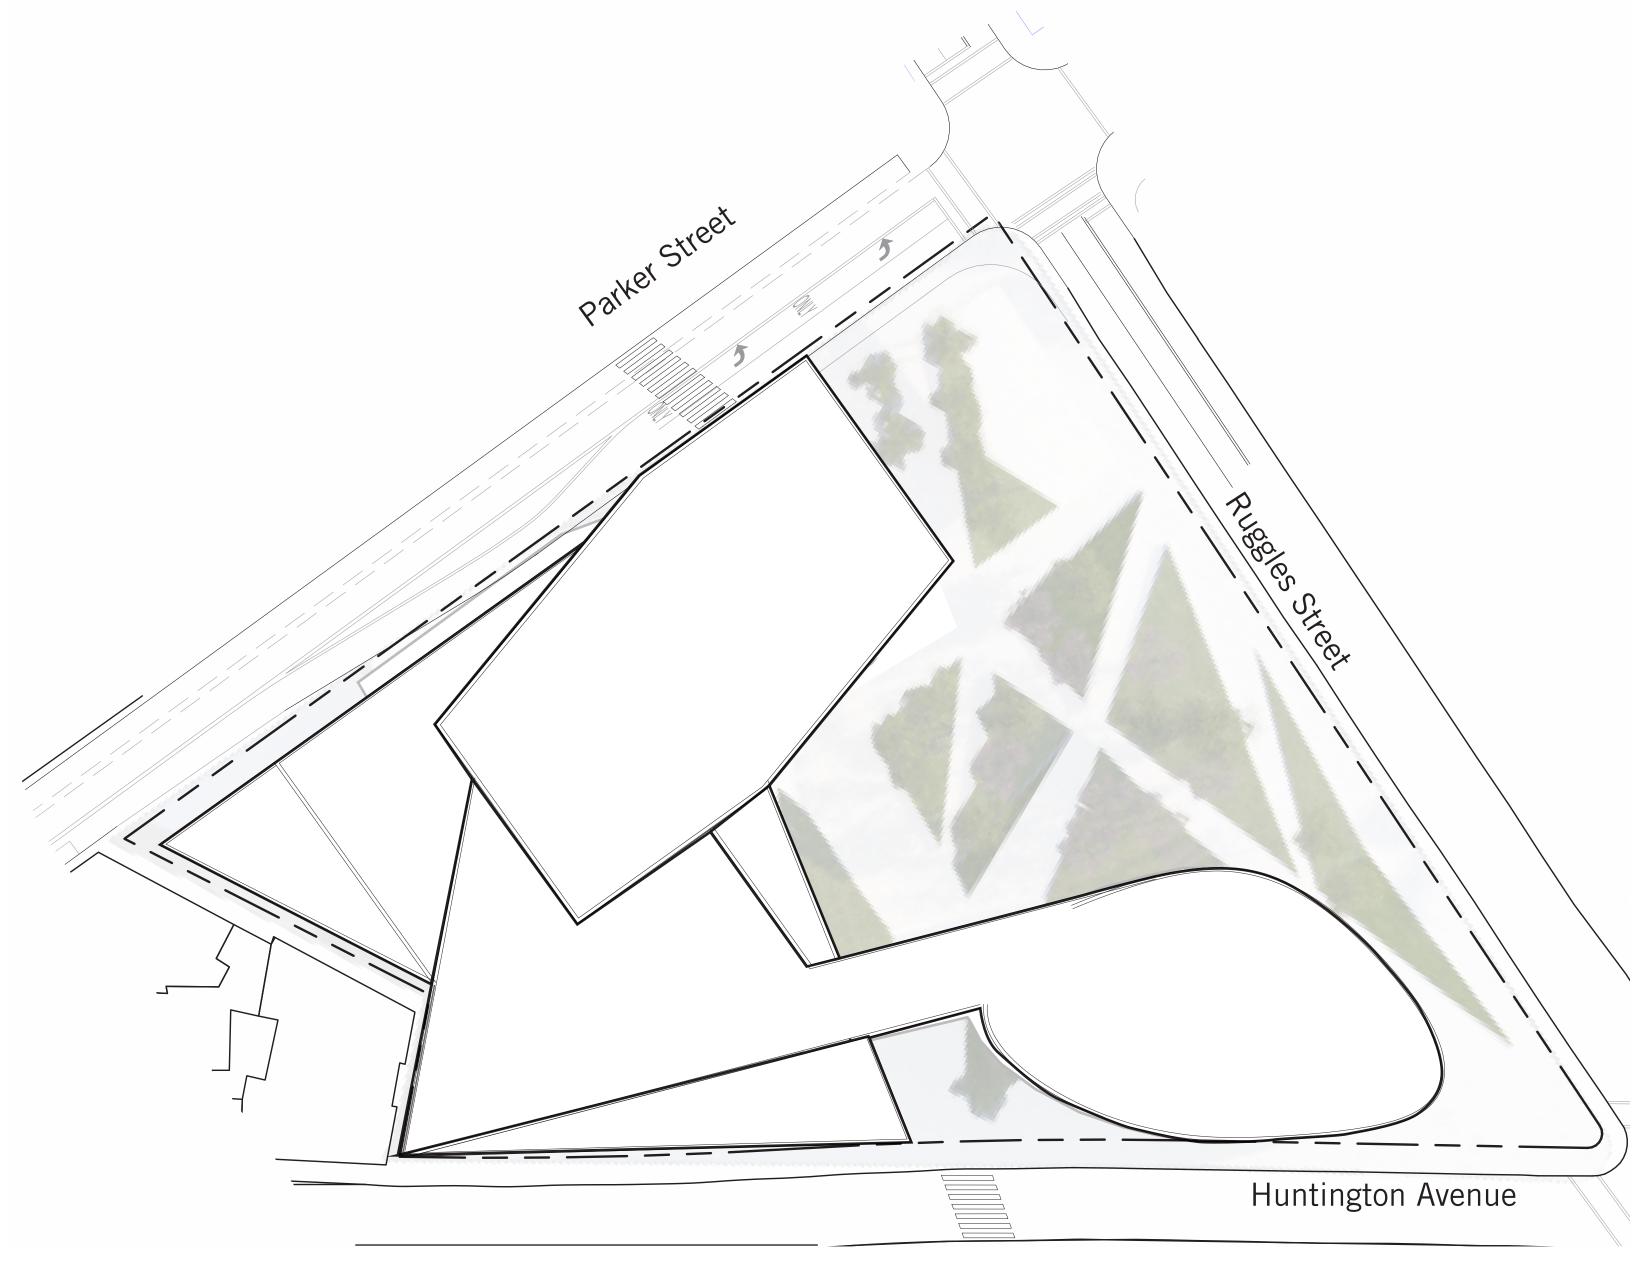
## EXHIBIT C PLANNED DEVELOPMENT AREA NO. 93 500 HUNTINGTON AVENUE BOSTON PDA CONCEPTUAL PLANS
